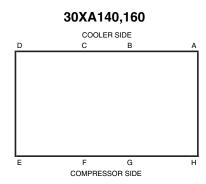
B — Unit Mounting Weights (Units with Al/Cu Condenser Coils)
